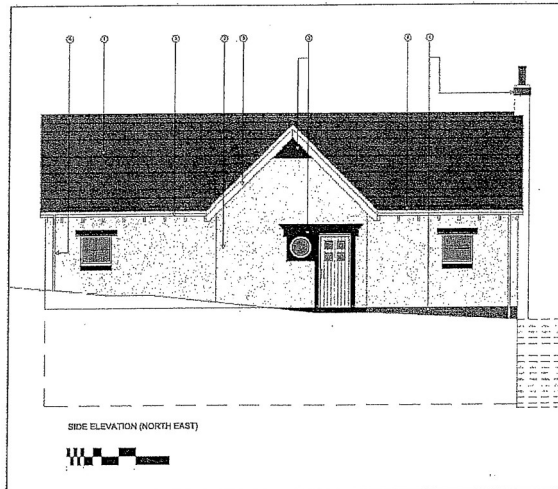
Drawing L(-)05 Back Elevation (North East) as proposed
